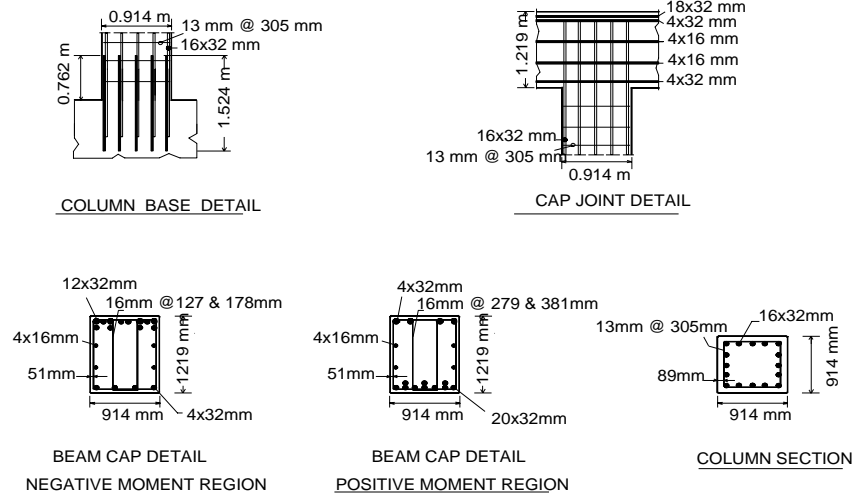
Column and beam cap section of 1962 reinforcement details
